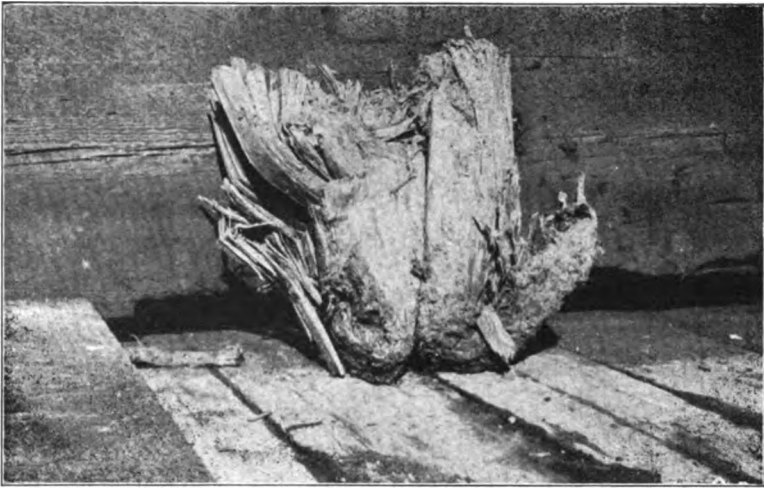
POINT OF OVERDRIVEN PILE EXCAVATED DURING THE CONSTRUCTION OF THE FOUNDATION OF THE COLUMBIA RIVER BRIDGE AT VICTORIA, WASHINGTON.
